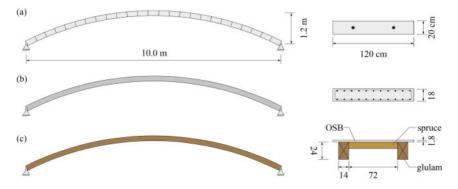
Alternative designs: (a) segmental arch made of new concrete blocks, (b) monolithic arch with passive steel reinforcement, and (c) timber arch.
